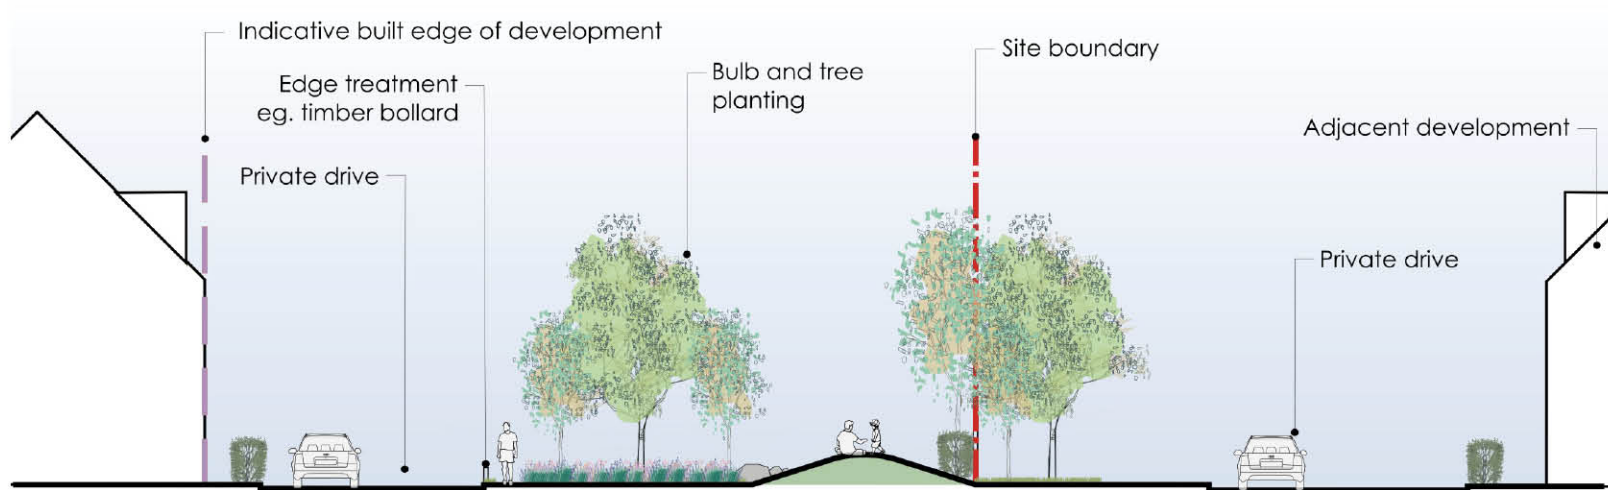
Illustrative Landscape Section A-AA: Section Through South Eastern Boundary
